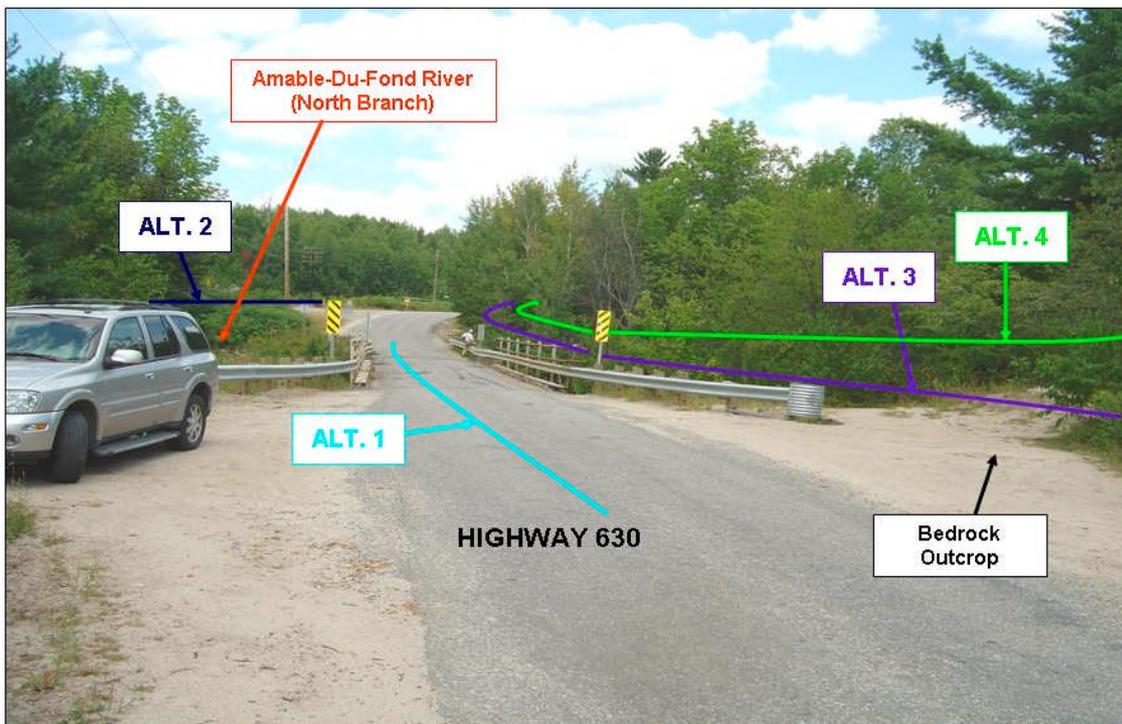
VIEW: Looking south from east side of north abutment of north Amable-du-Fond River Bridge. Alternative 3 is the preferred alignment. (August 17, 2006)
